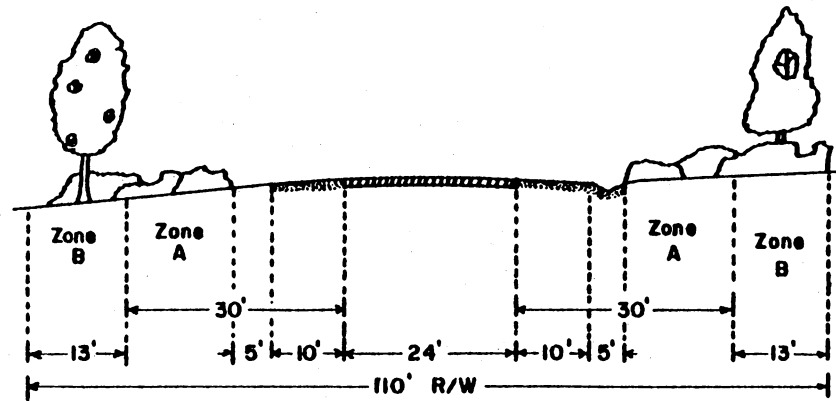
Cross section of a secondary highway or undivided primary highway right-of-way with zones and maximum zone widths indicated.
